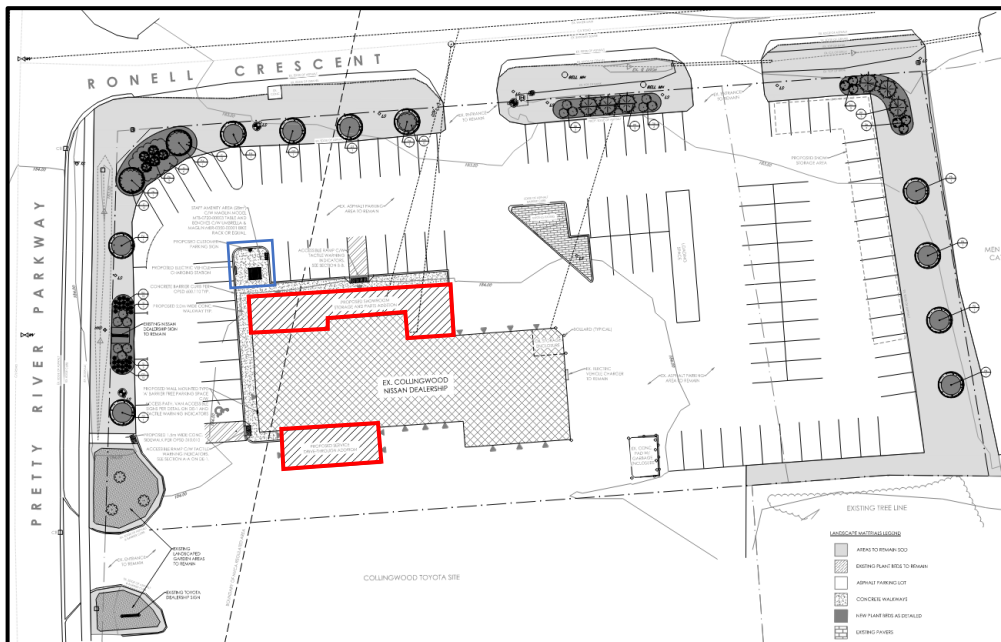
Site Plan, proposed building additions outlined in red, amenity area in blue, and landscaping in dark grey.
